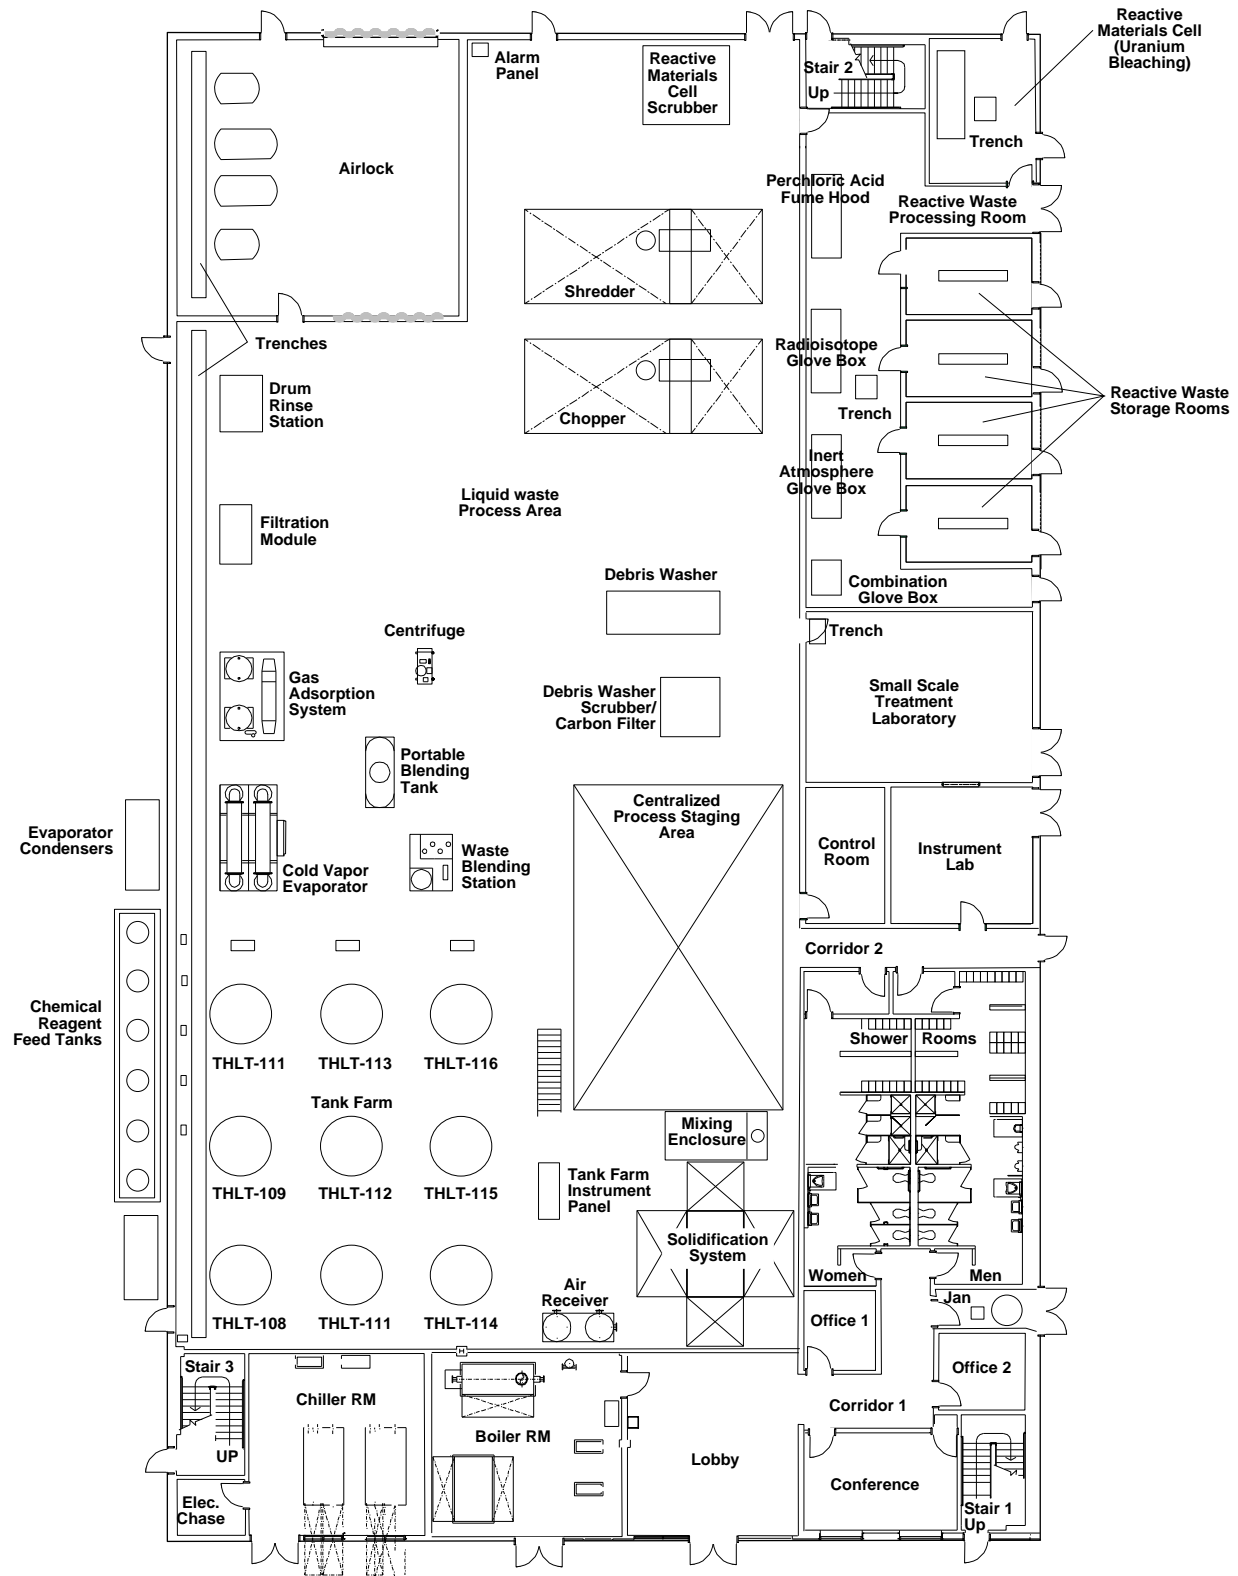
Building 695 Storage/Treatment Unit Group Layout
